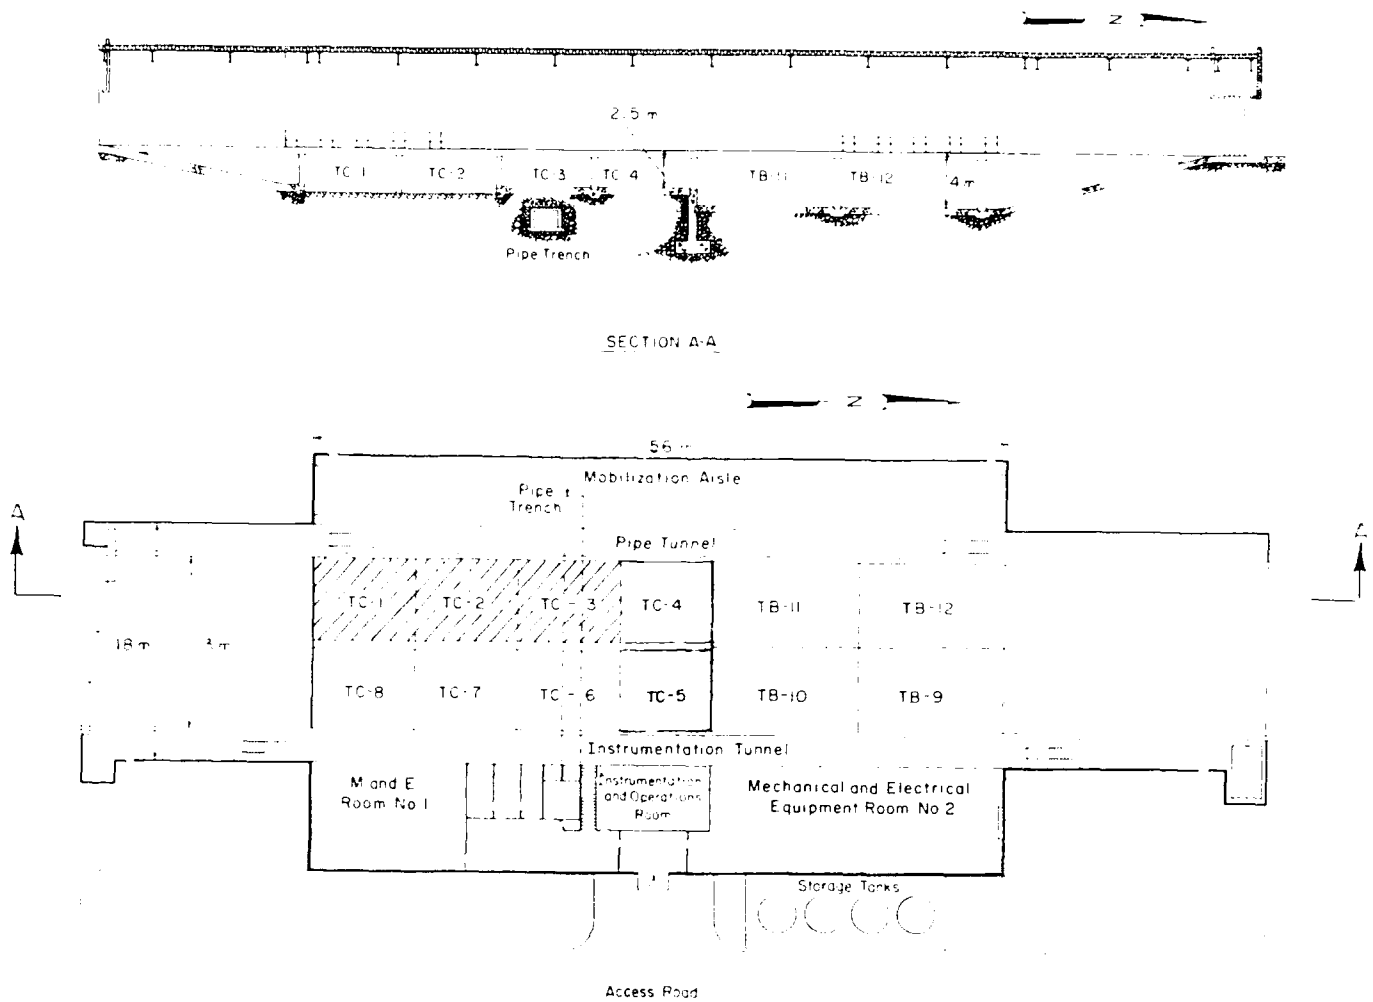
Plan and cross section of CRREL's Frost Effects Research Facility.
